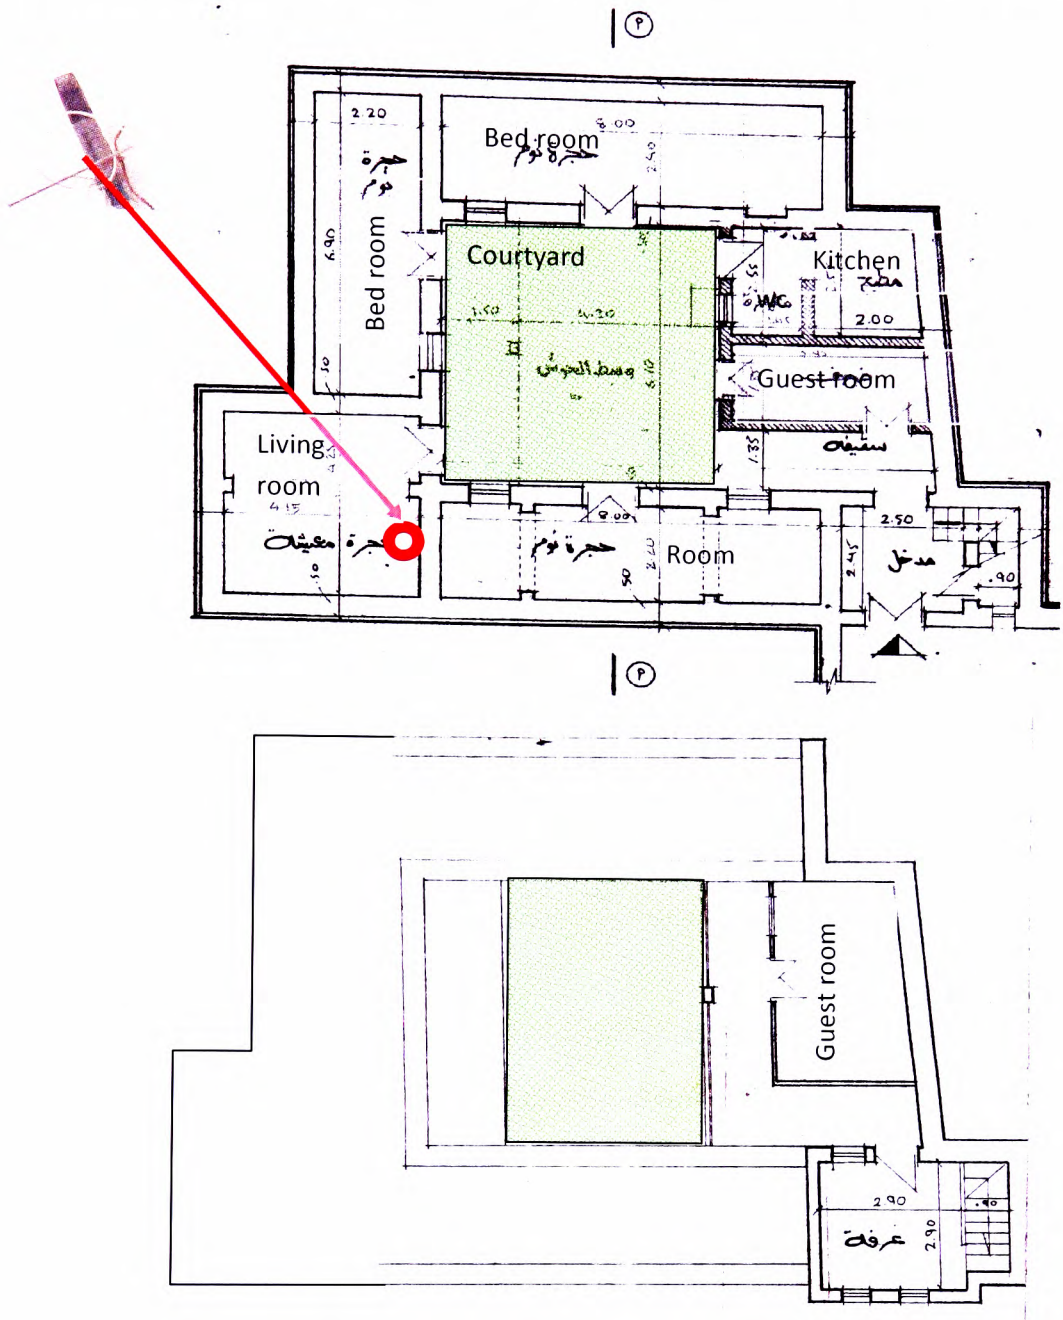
Ground and first floor plan showing the position of the survey instrumentation.
